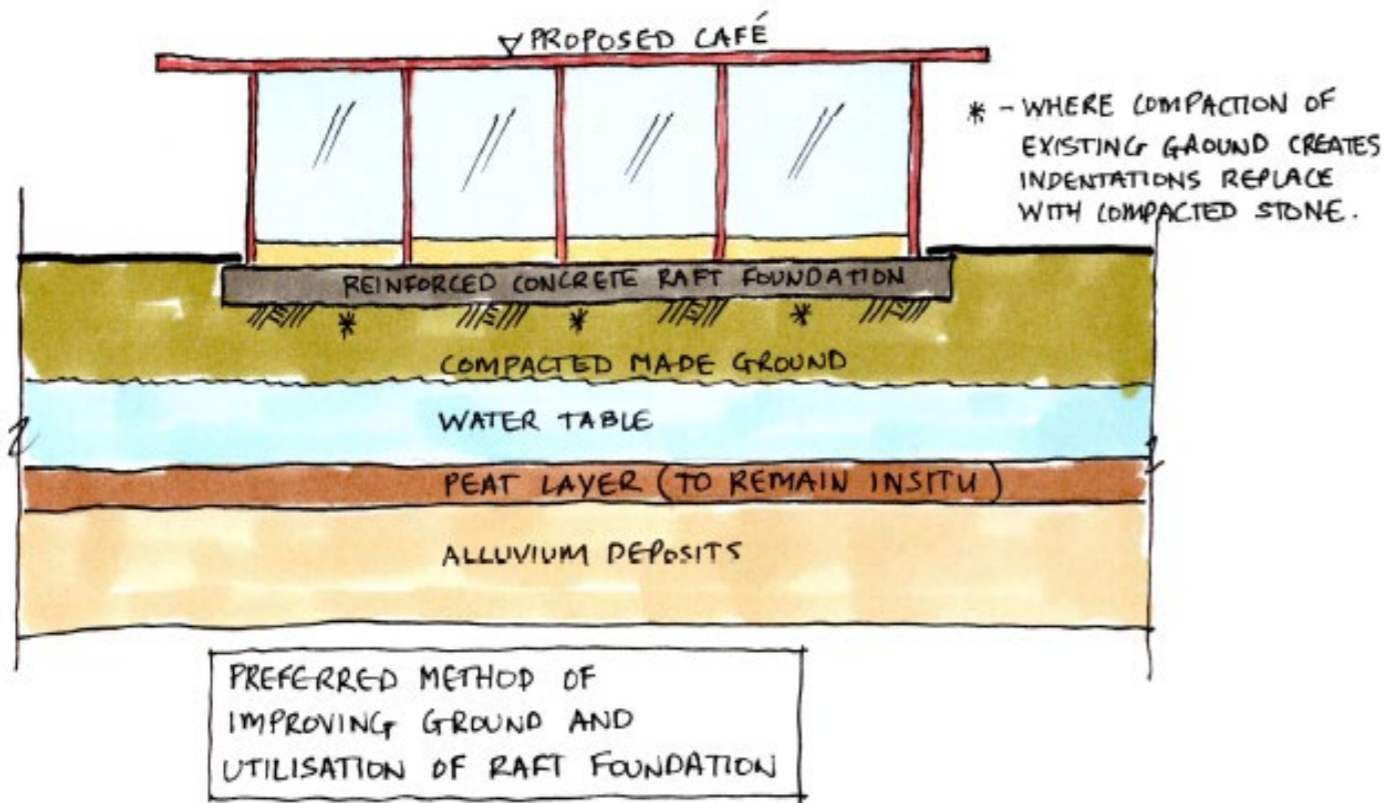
Reinforced Concrete Raft Foundation & Compacted Ground
